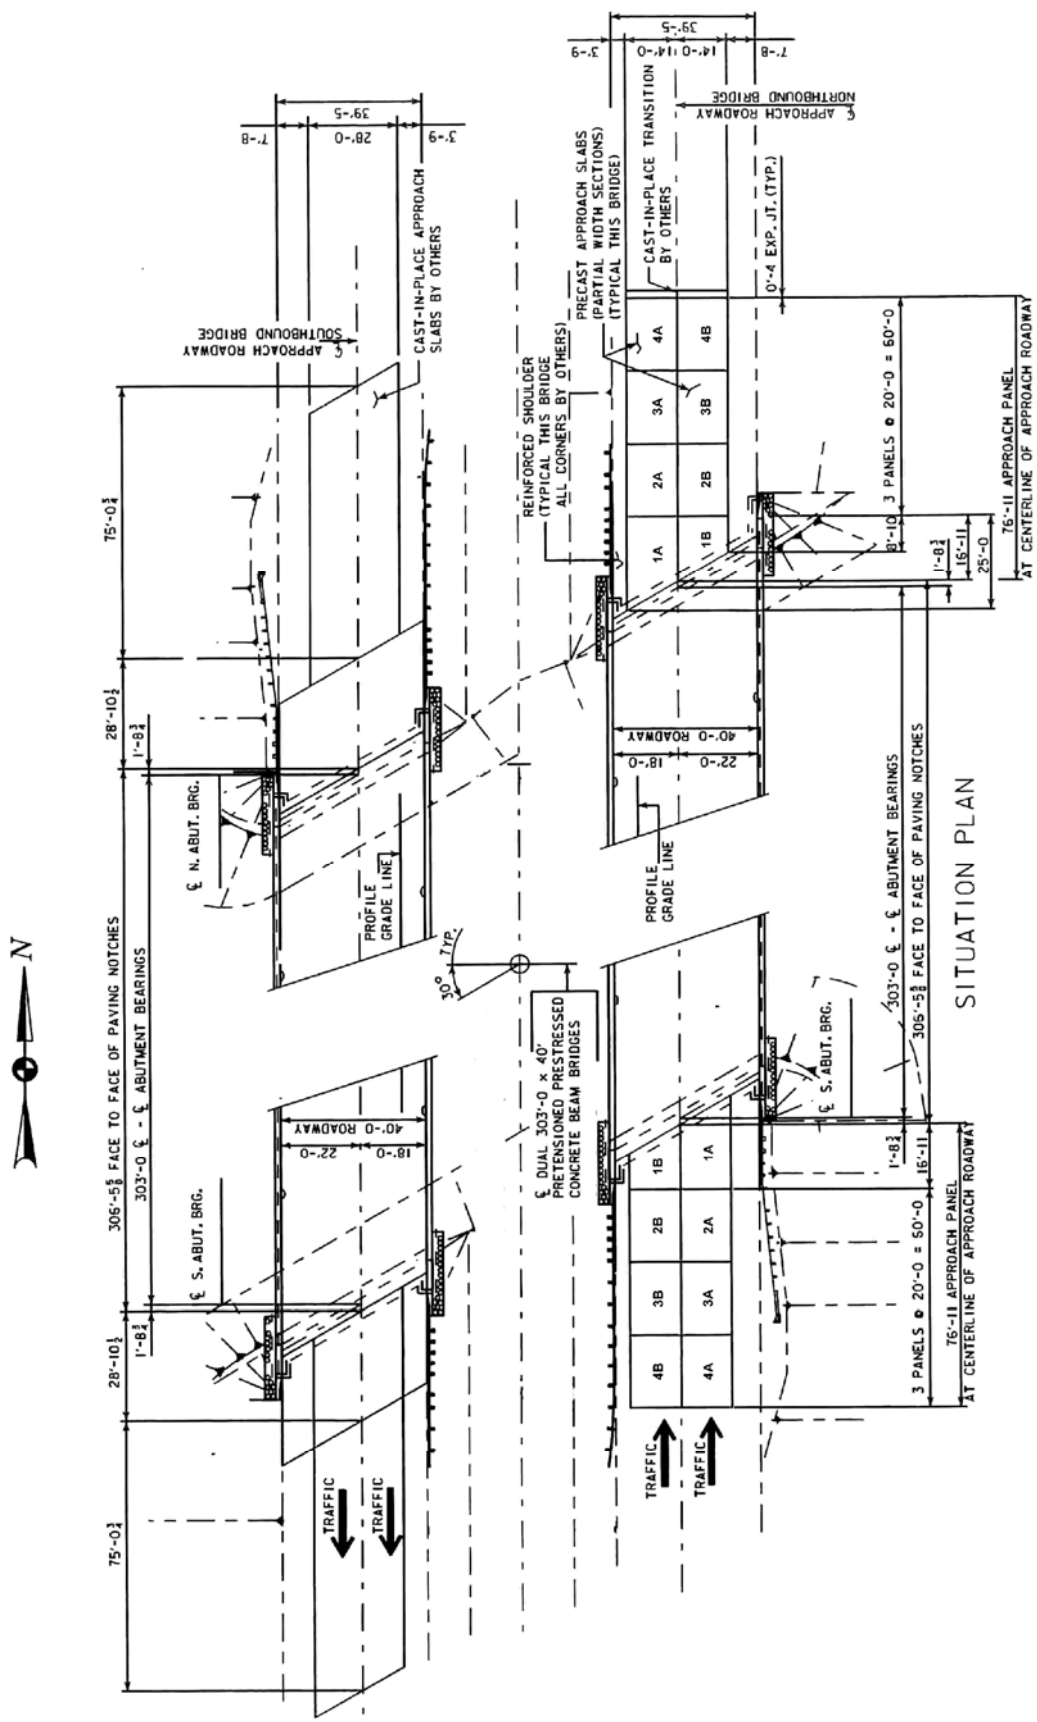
Illustration. Situation Plan for the Highway 60 bridge and precast approach slabs.
